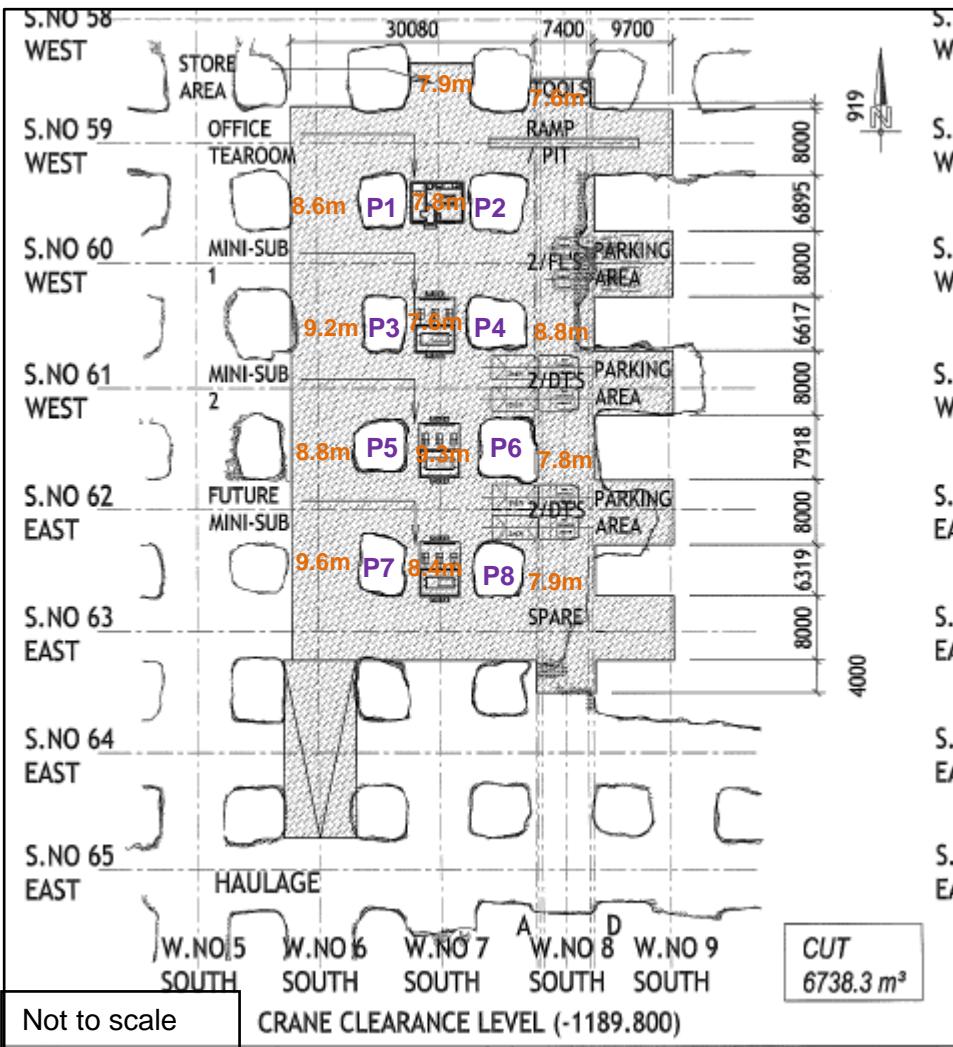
Plan indicating bord width around the pillars where footwall lifting will be conducted.
